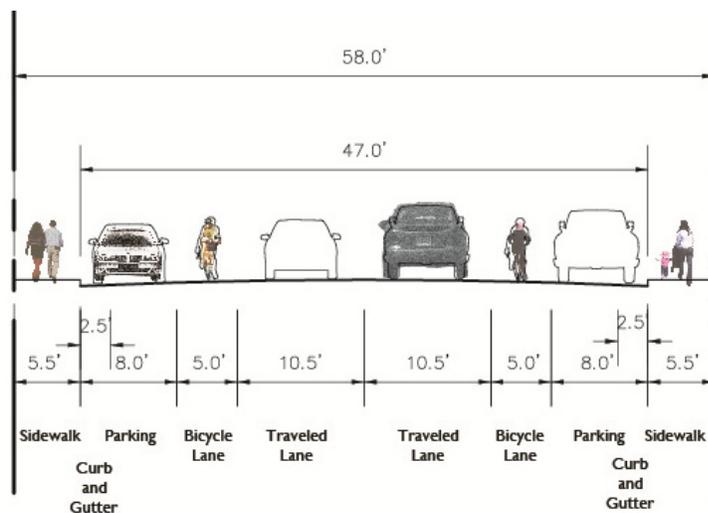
SEVENTH AVENUE PROPOSED SECTION (BETWEEN TULSA AVENUE TO OKMULGEE AVENUE)
